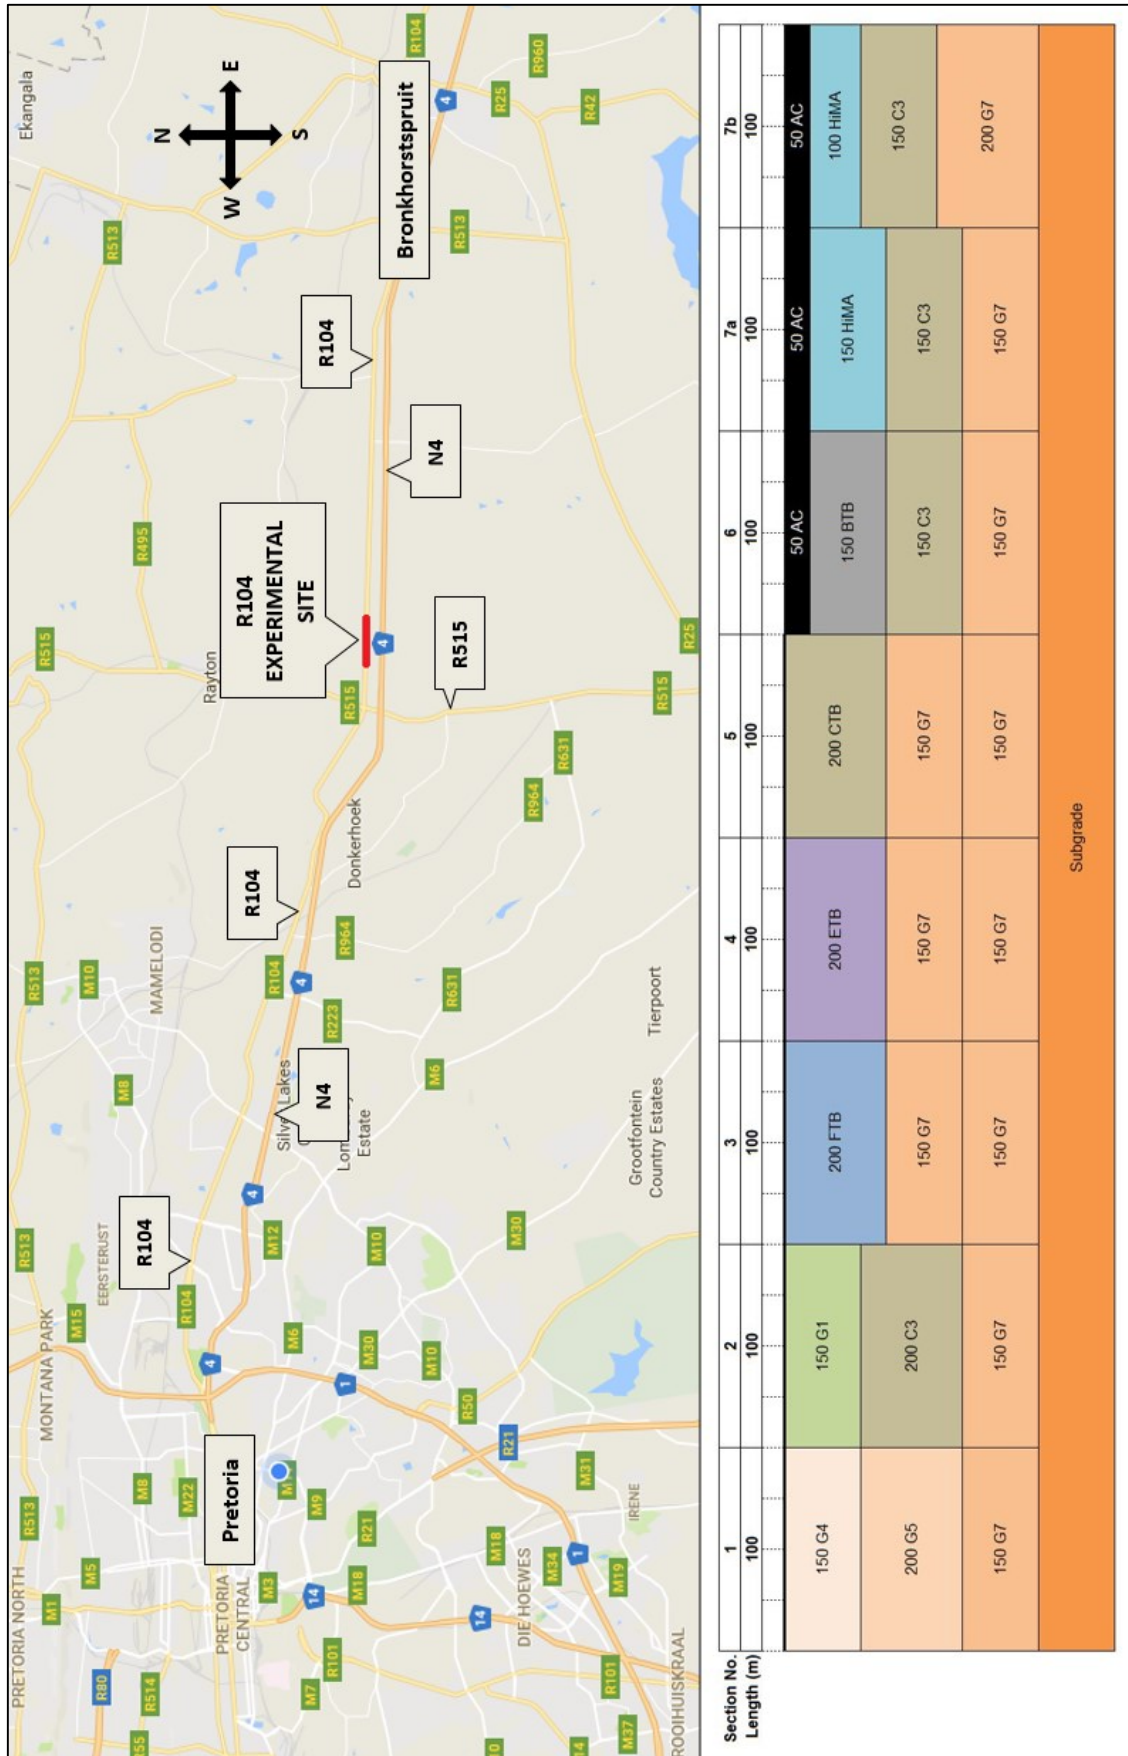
Location and longitudinal cross-section of SANRAL testing facility.
